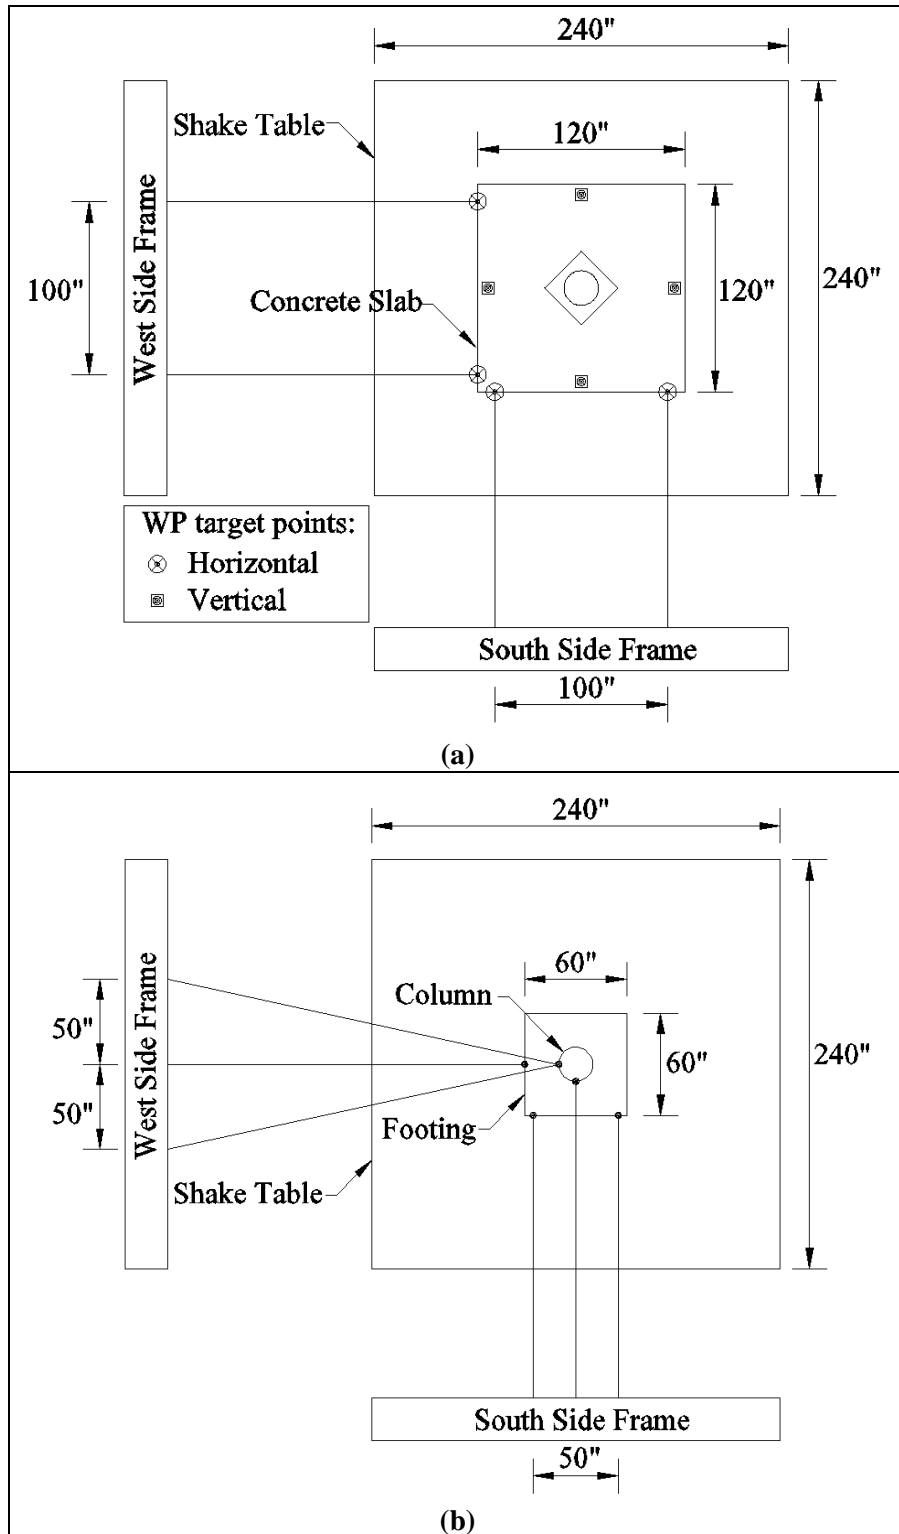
Top view of the WPs installed on: (a) the concrete slab; (b) the column and the footing.
